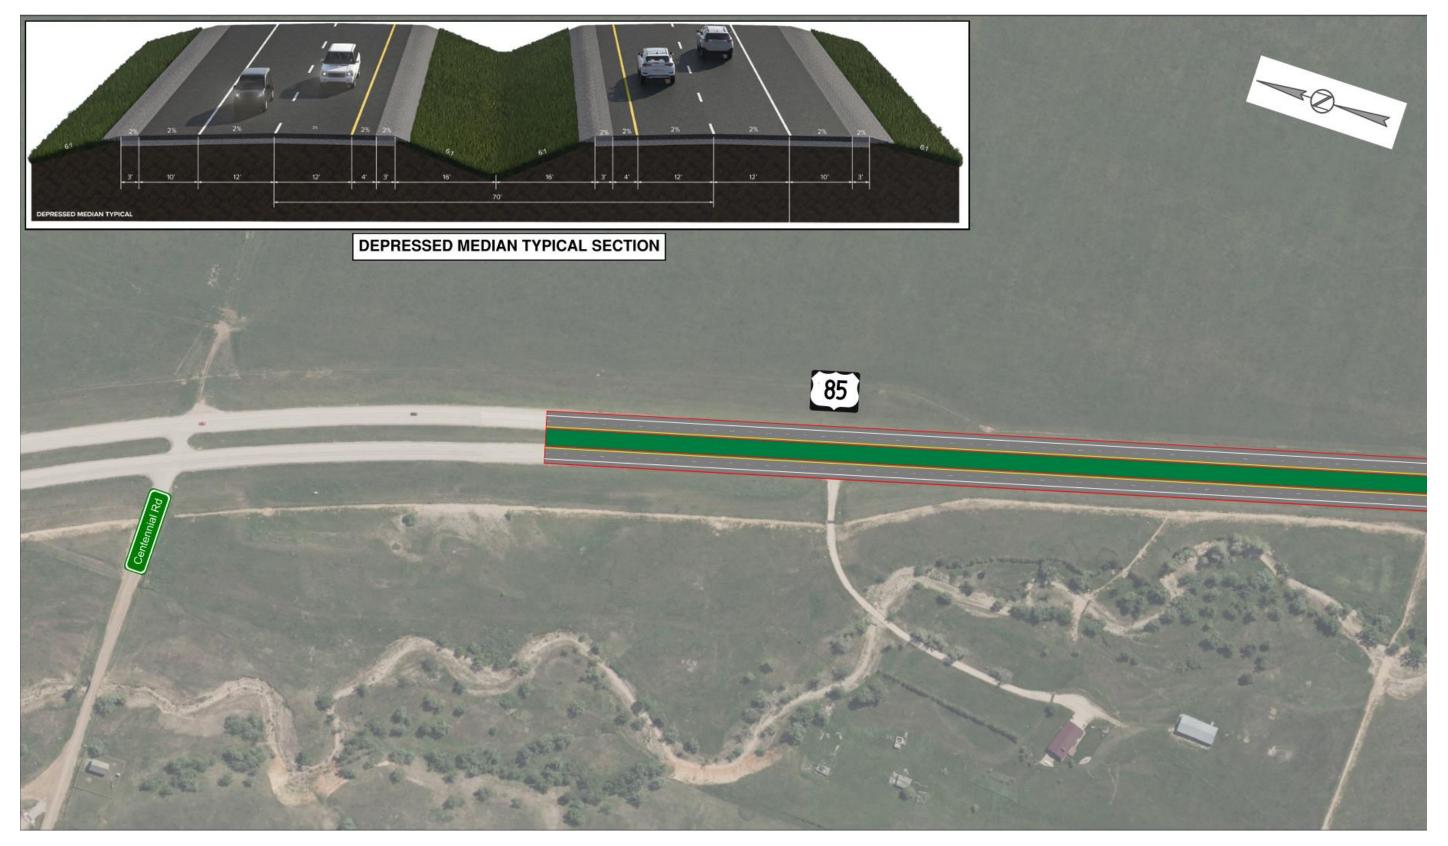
Alternative I1 – Extend Existing Typical Section to Crook City Road/Pendo Road
